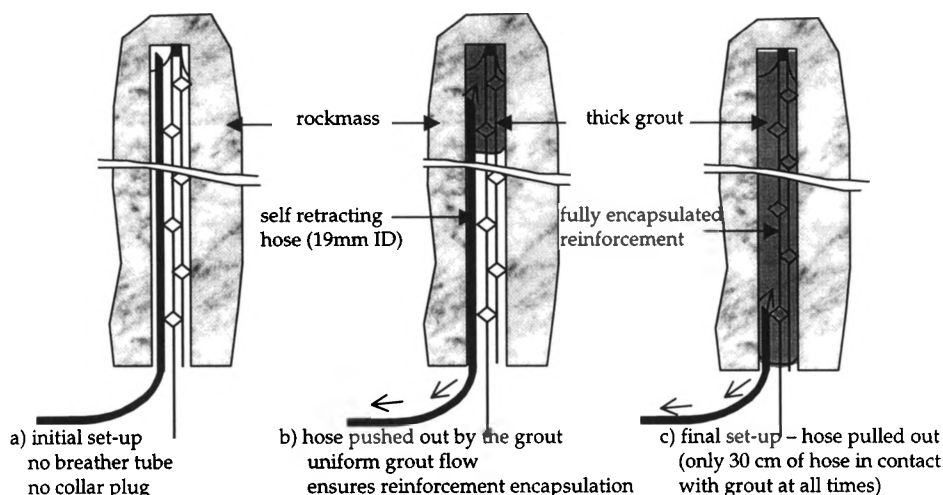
Advanced grouting (toe to collar) method (not to scale).
